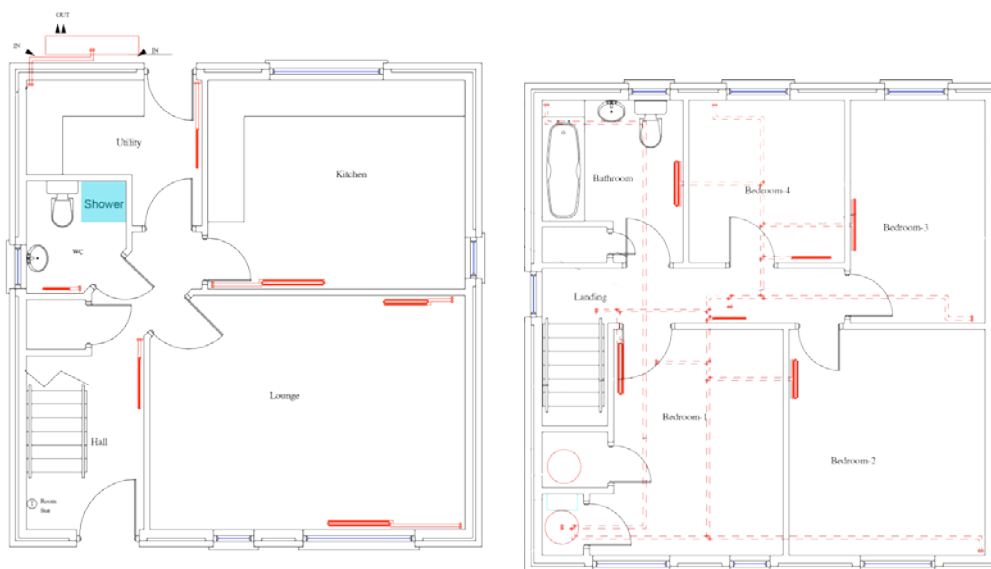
Room plans of dwelling 8, Ground Floor (left), First Floor (right)
